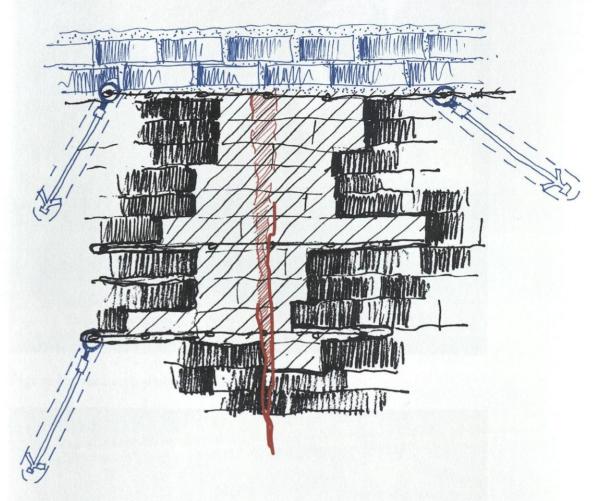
Schematic sketch of wall section showing an area that was removed and horizontal reinforcement and mechanical ties installed prior to the reconstruction of the damaged portion. The red vertical is the location of the existing crack.
